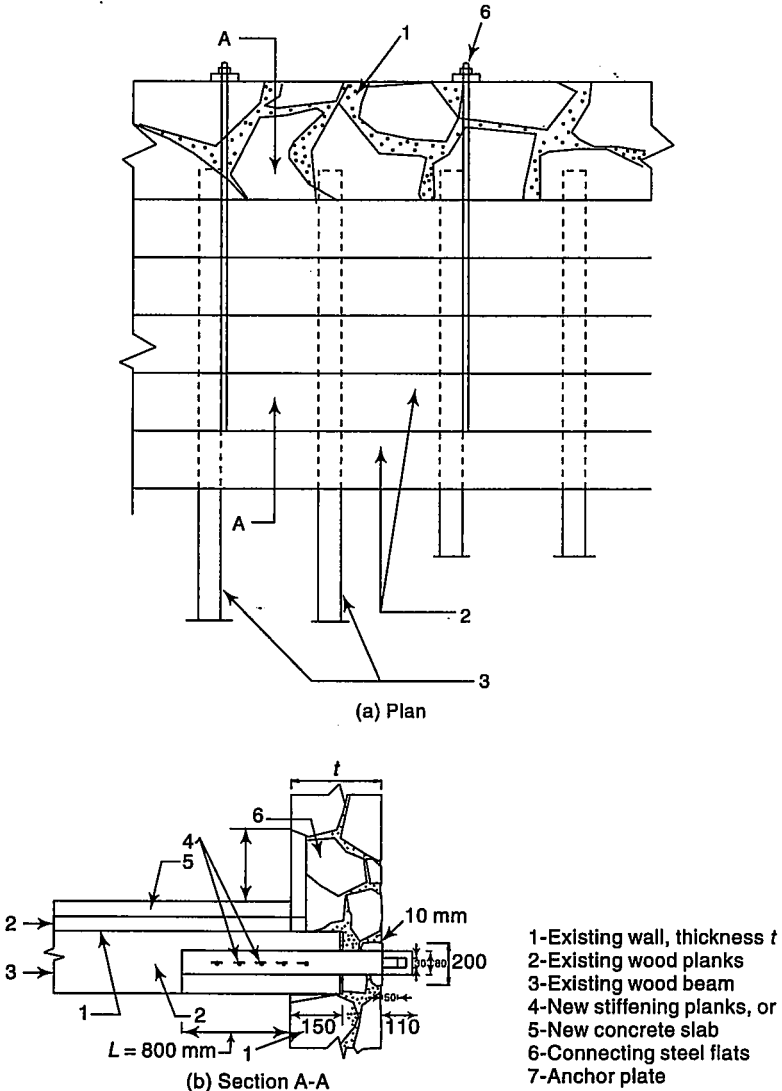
Connection of floor to wall (beams orthogonal to walls)-
